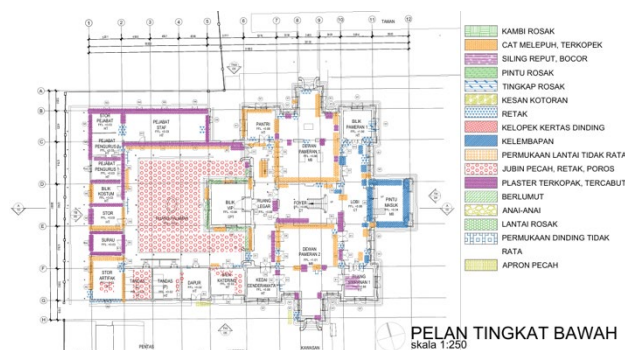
Building defect mapping for ground floor of Dato' Jaafar Building. The red dots indicate spalling, crack and porous stone tiles that occurred in the outdoor courtyard section.
